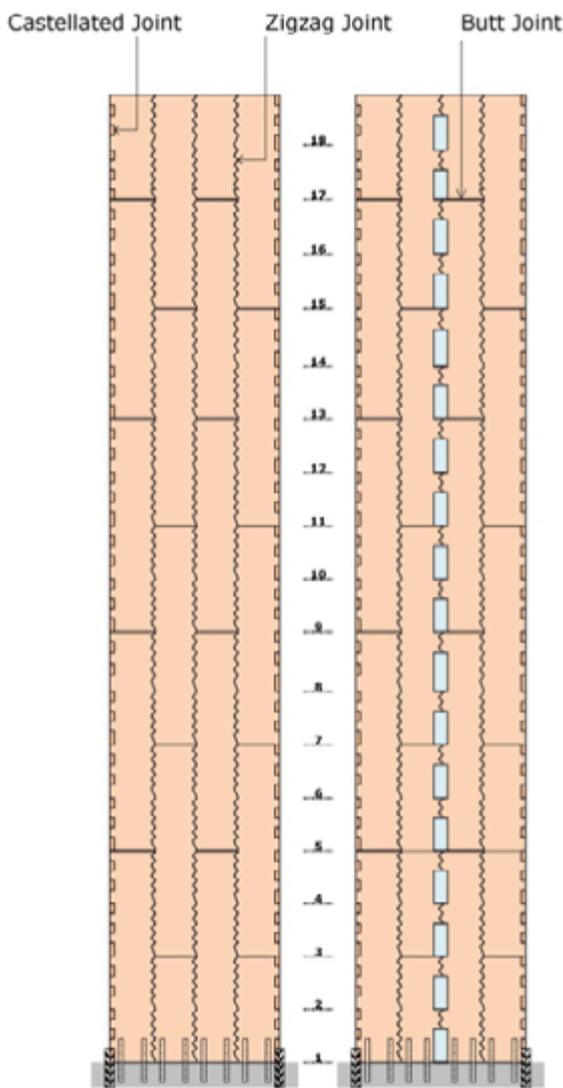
Eighteen level Integrated Panel Core - Side and End Elevations. Foundation attachments shown - hold down connections, and cantilever steel members (at corners)
